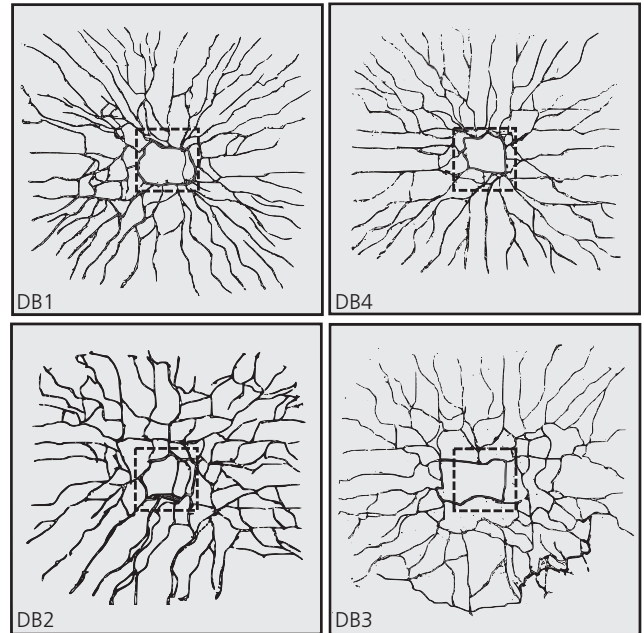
Crack patterns for specimens DB1–DB4, which had a low reinforcement ratio (test series 1)
